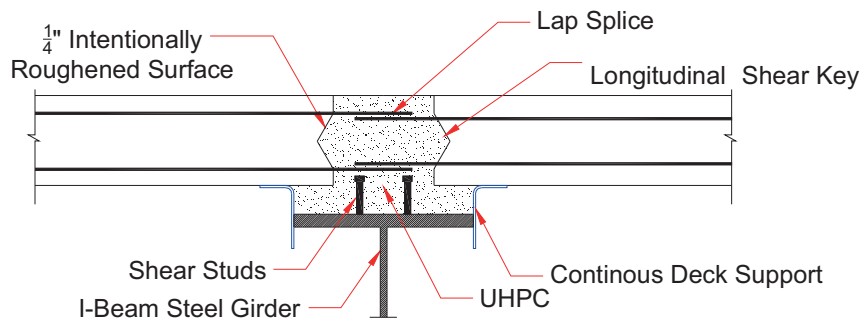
Panel-to-Panel Connection over Steel Girder (Graybeal 2014)
